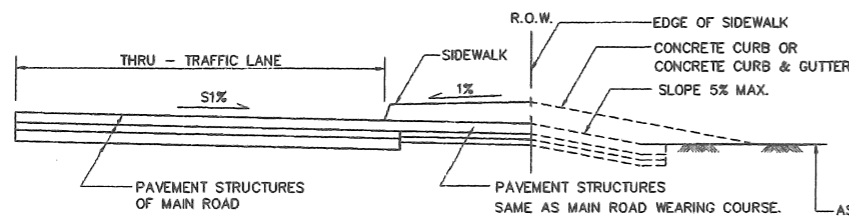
TYPICAL PUBLIC SIDE ROAD AT SIDEWALK (PROFILE)
